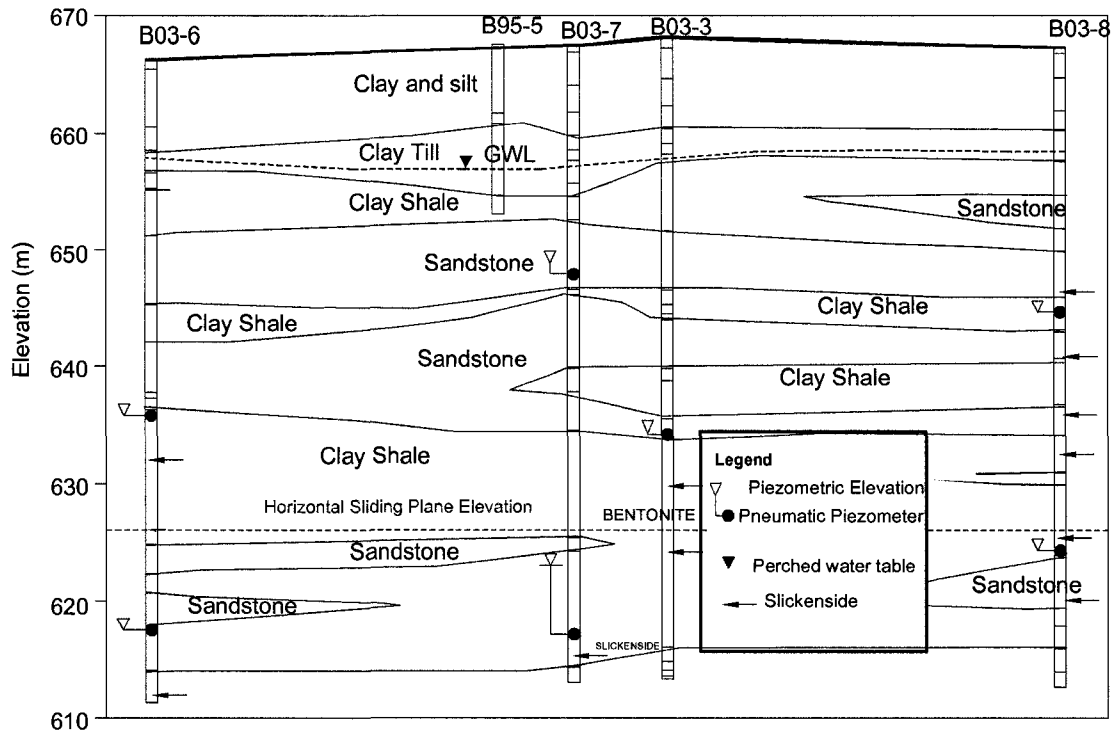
Stratigraphic profile behind the valley wall (Figure 7-5 Section A-A)
